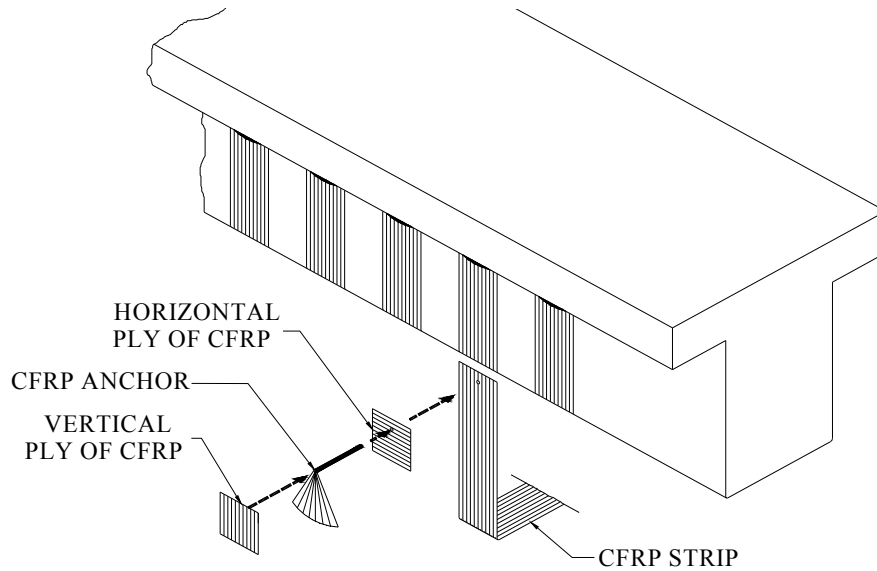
Isometric view of U-wrap with CFRP anchorage system (Kim, 2011)
